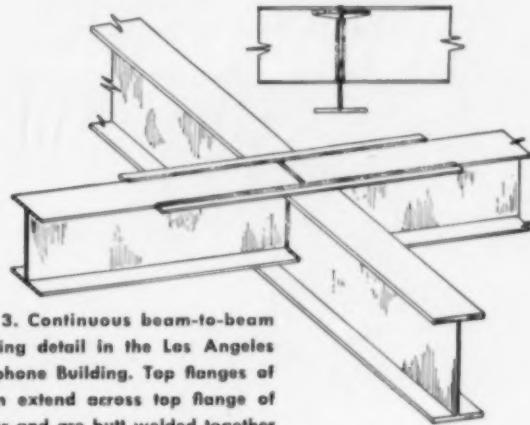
Continuous beam-to-beam framing detail in the Los Angeles Telephone Building. Top flanges of beam extend across top flange of girder and are butt welded together on center line of girder.
